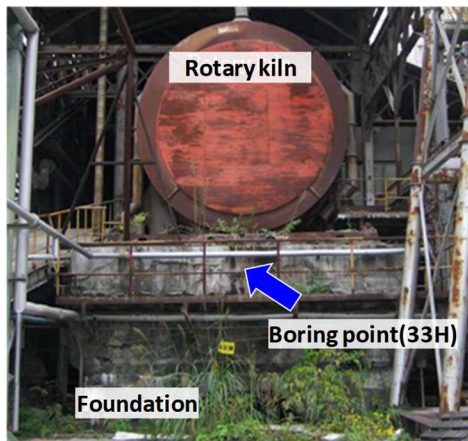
Drilling point of specimen ³³H (foundation of cement rotary kiln).
